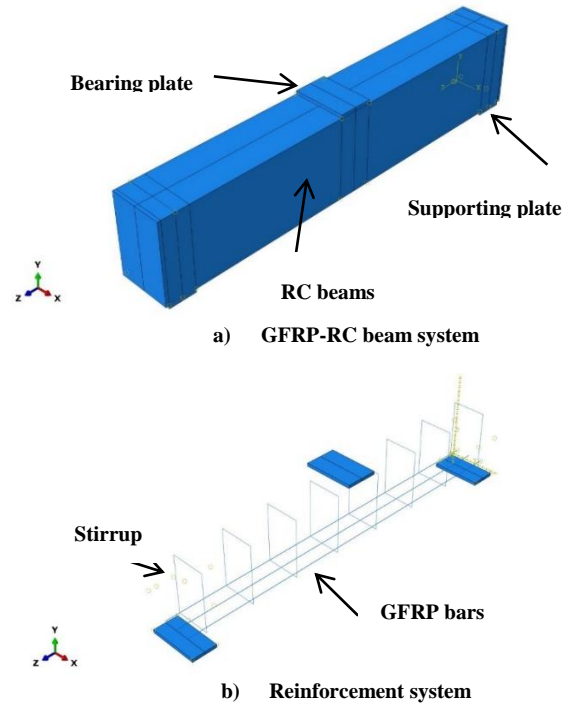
Schematic representation for the assembled parts of GFRP-RC beams
